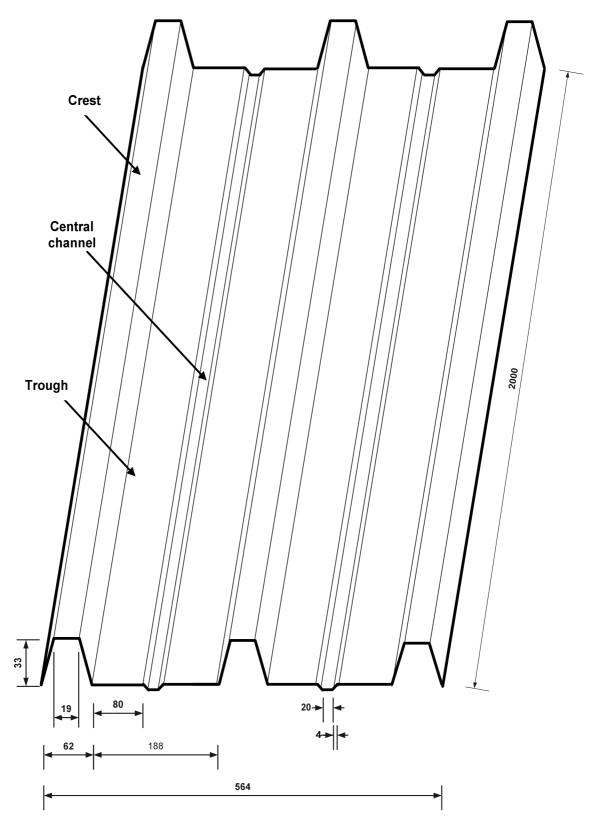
Corrugated sheet dimensions used for prototypes (All dimensions are in mm).
